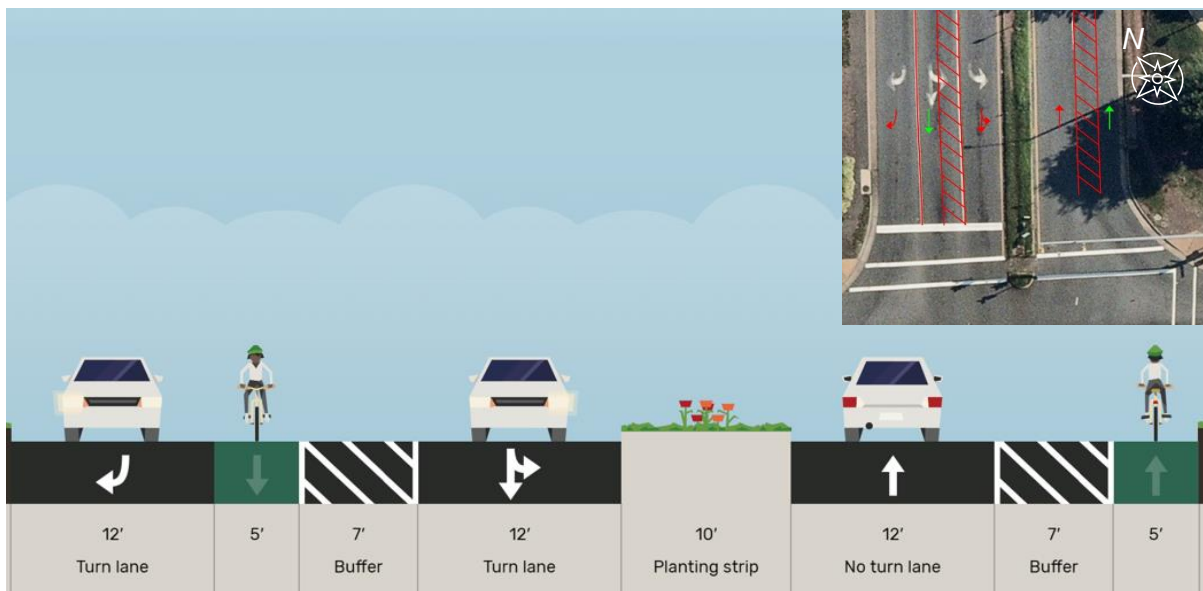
Intersection of Metrotech Drive and Route 50 Build Conditions Cross Section and Plan View
